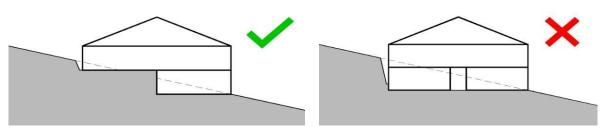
Habitable rooms are to have ample openings to an external wall for air and light.
